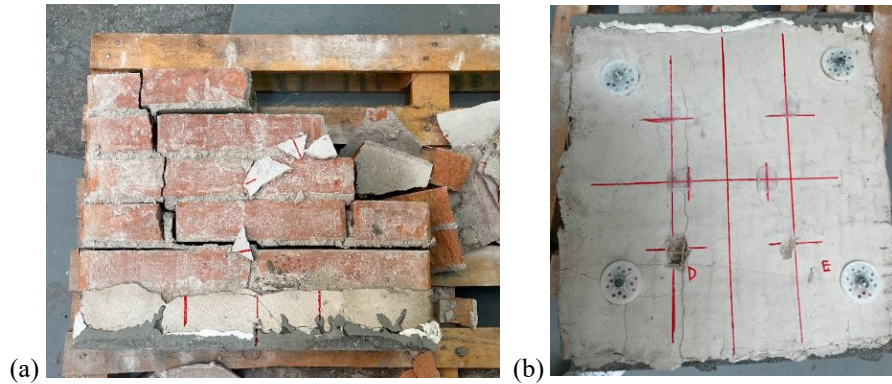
Unreinforced (a) and reinforced (b) masonry samples after compression tests.
